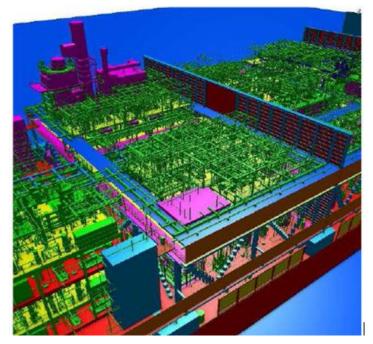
Cross-deck blastwalls on an FPSO (note escape tunnel at bottom right).
